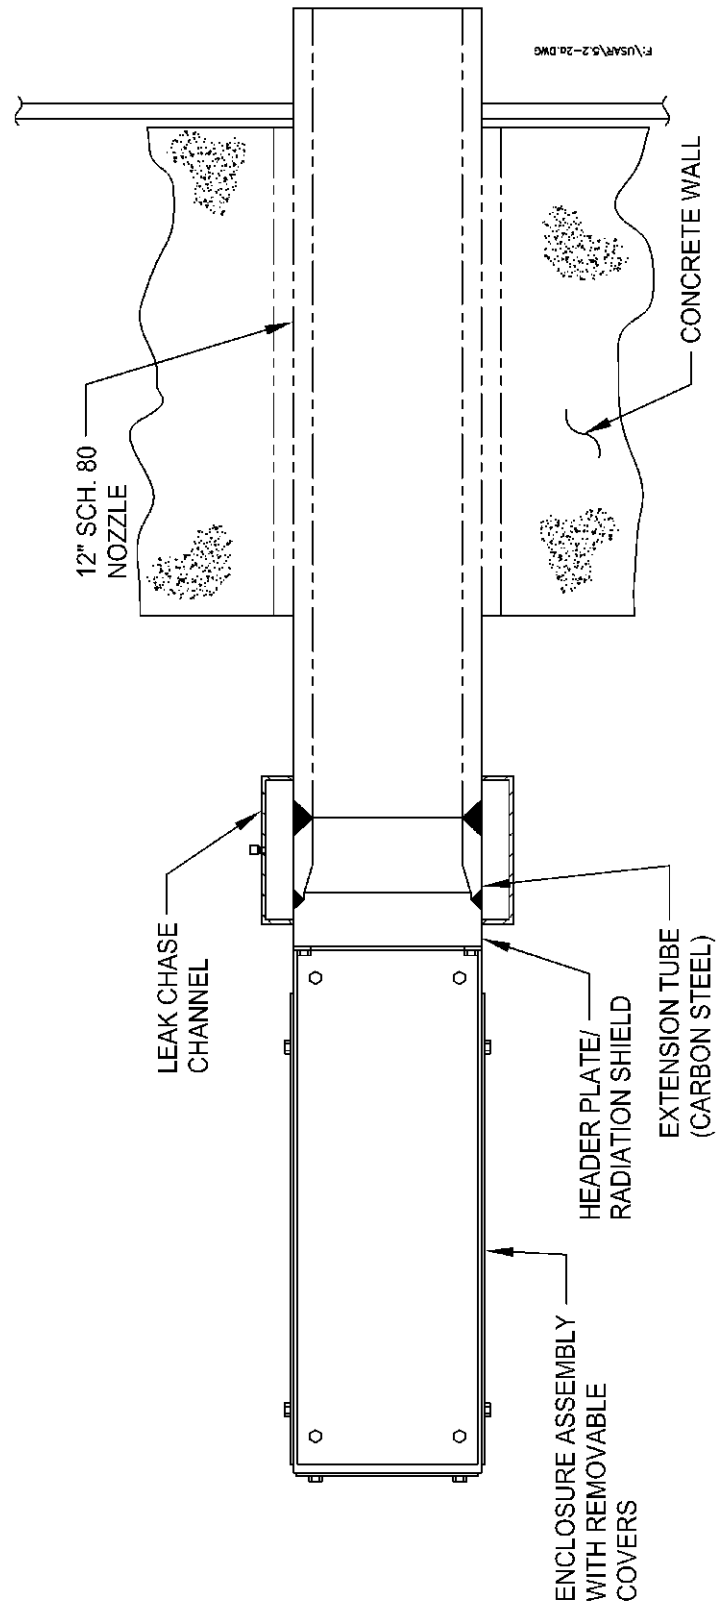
Center Section - Low Voltage Power and Control Electrical Penetration Assembly
